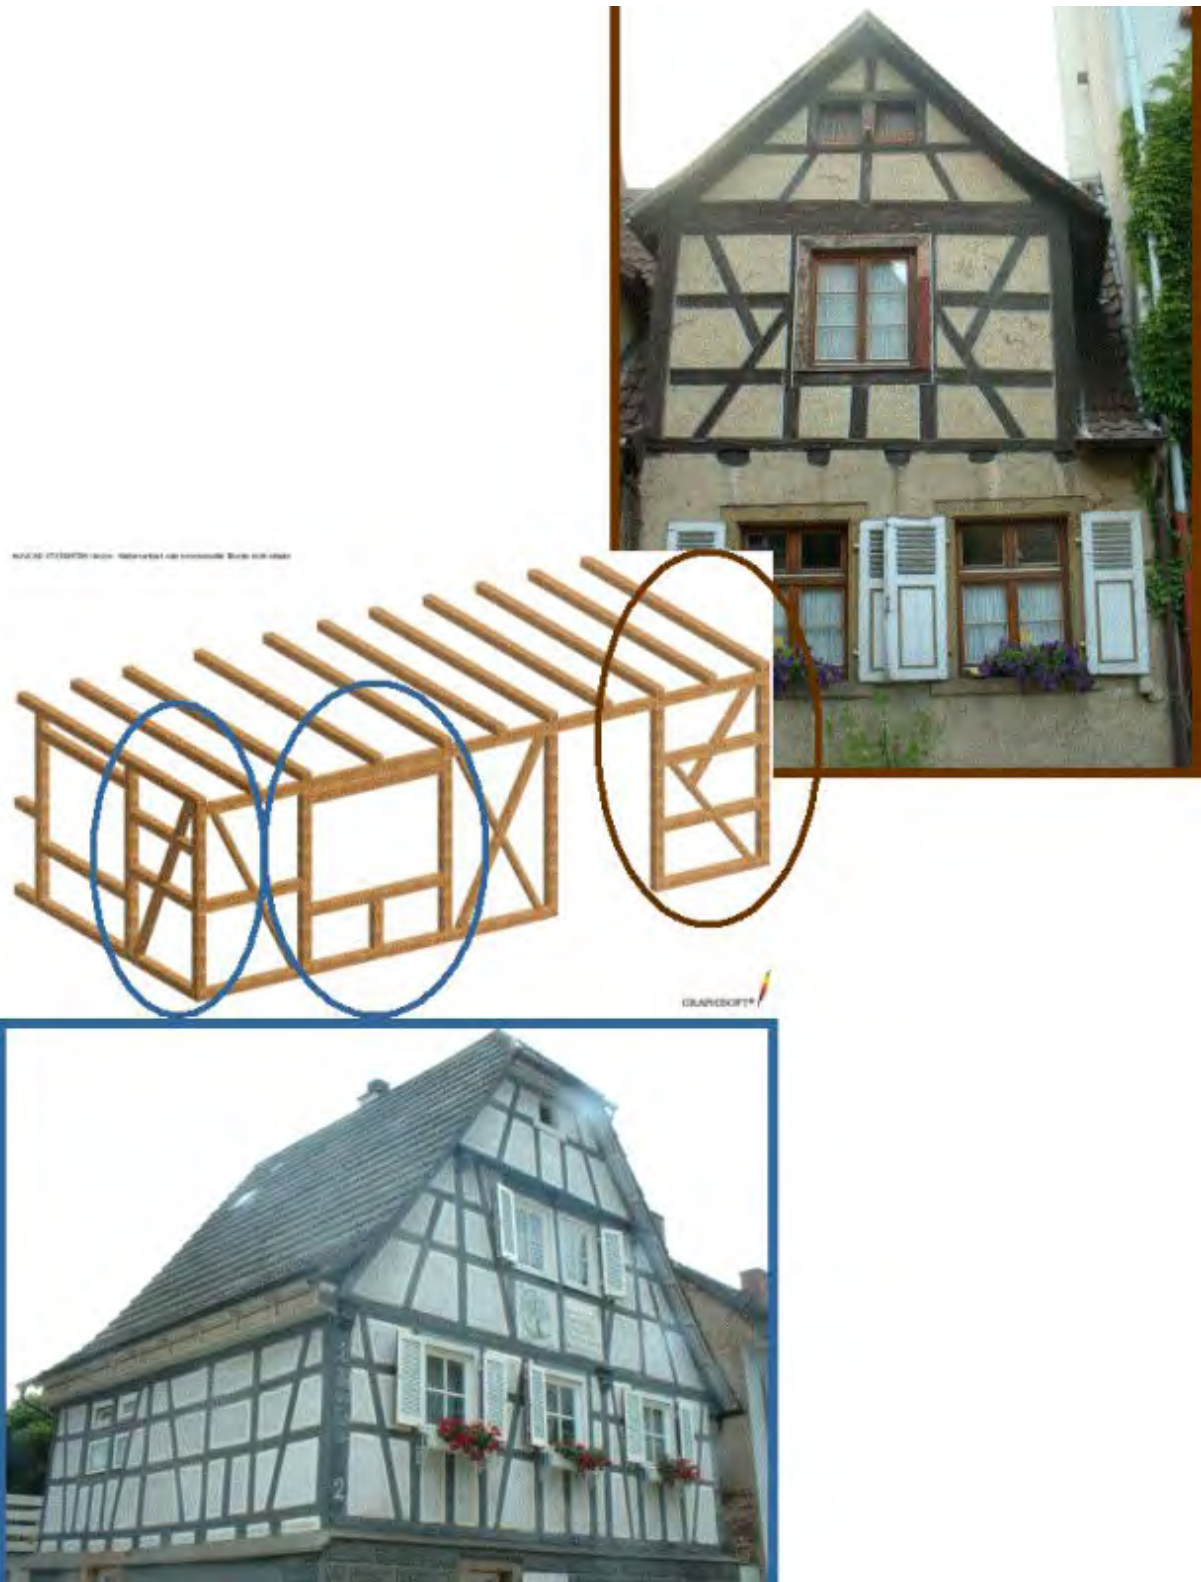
Key load bearing elements exemplified on two typical buildings. Photos by M. Kauffmann, 2004.
